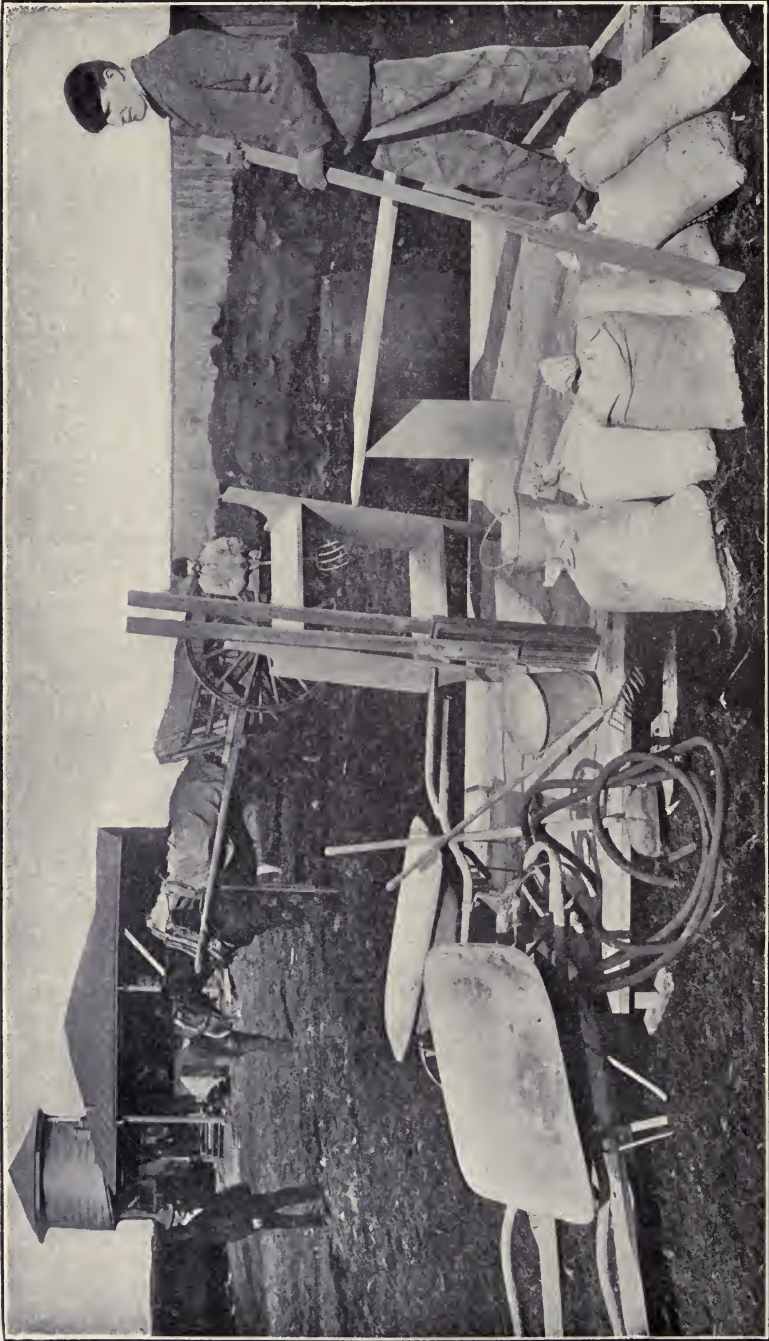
Concrete Mixing Plant, showing Concrete Board, Tools, etc., Necessary for Mixing Concrete by Hand.
